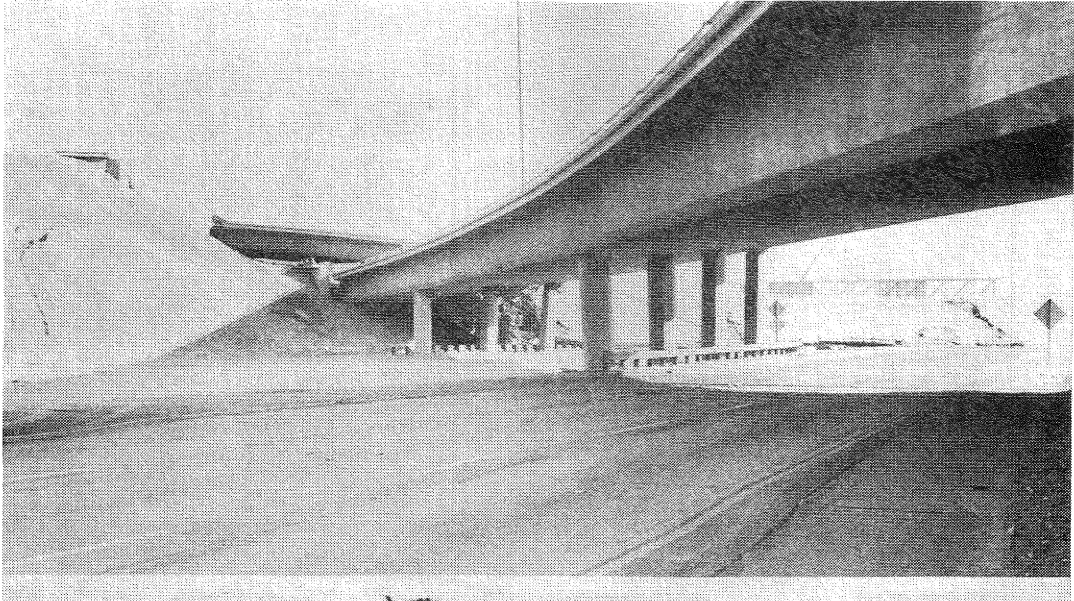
The Northwest Connector Overcrossing, Golden State - Foothill freeway interchange, looking east. The Separation and Overhead bridge fell on the span adjacent to the eastern abutment of this bridge.
